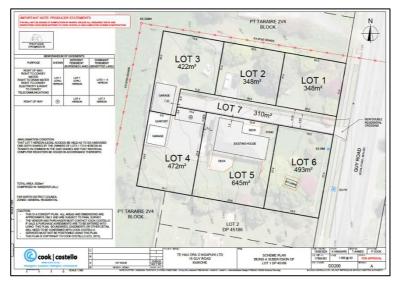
Proposed Scheme Plan [Source: Cook Costello]
